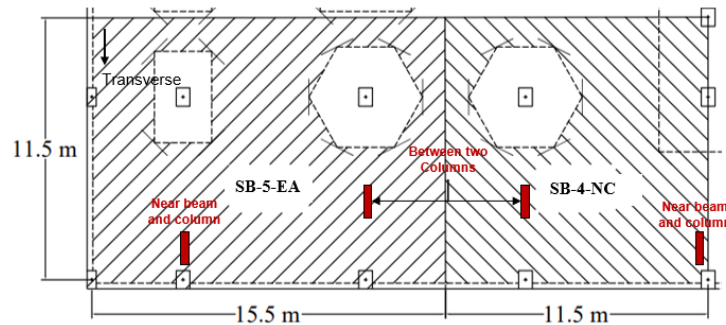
Investigated location for slab on beam at construction site 2 (SB-4-NC & SB-5-EA)
